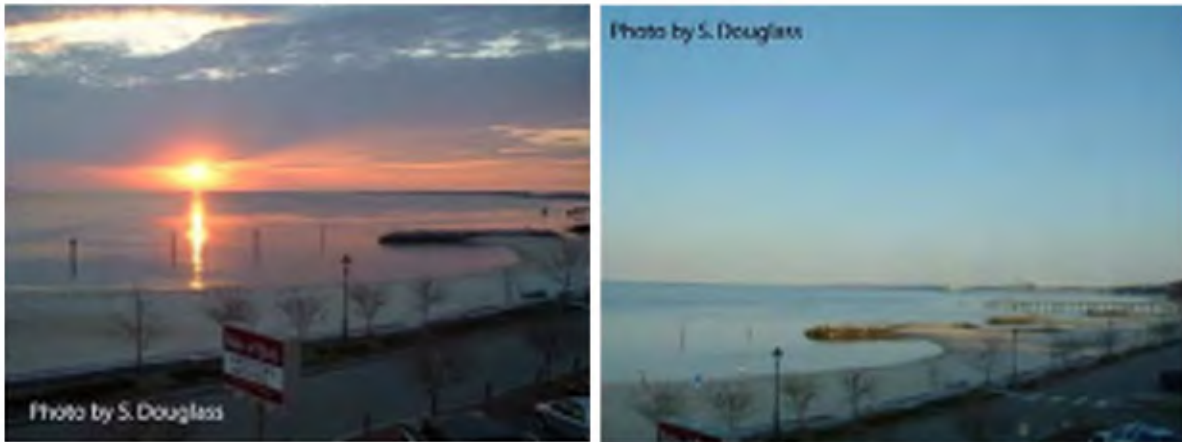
Beach nourishment project stabilized as pocket beaches with a headland breakwater system protecting a road (Water Street, Yorktown, Virginia)
